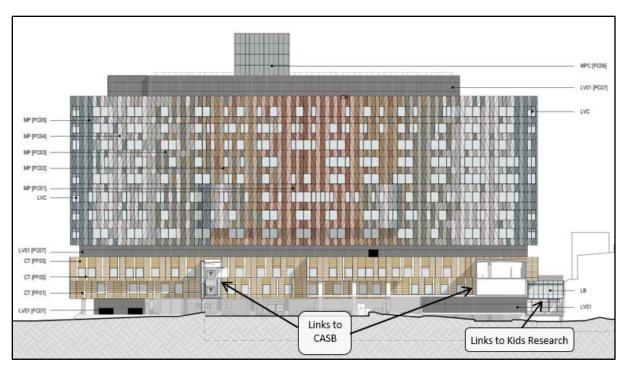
| PSB south-west elevation and materiality (Source: Applicant's RtS)
